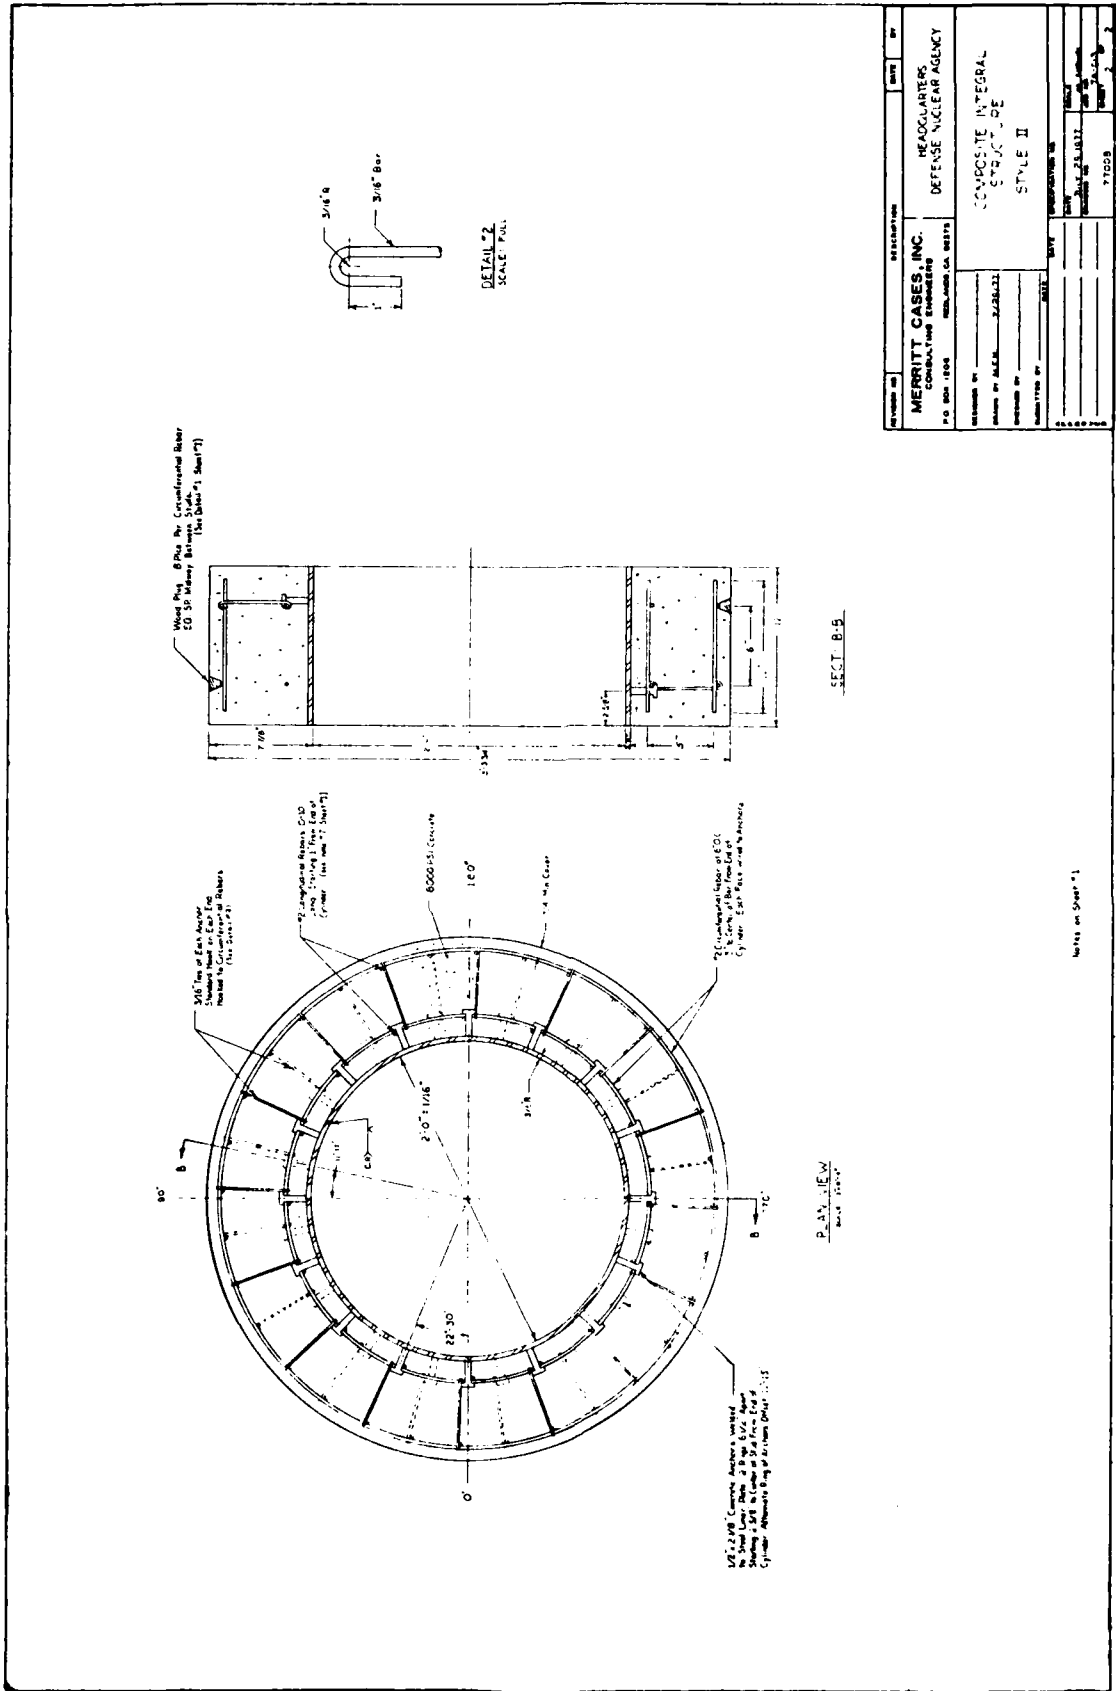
Details of MIGHTY EPIC C-Y-16 test specimen.
